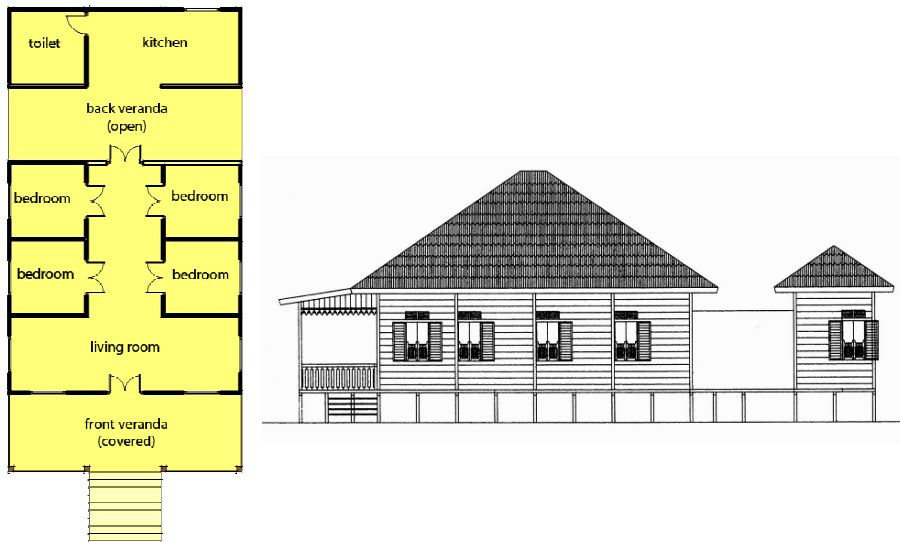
Typical plan and side elevation view of melayu Pontianak house
